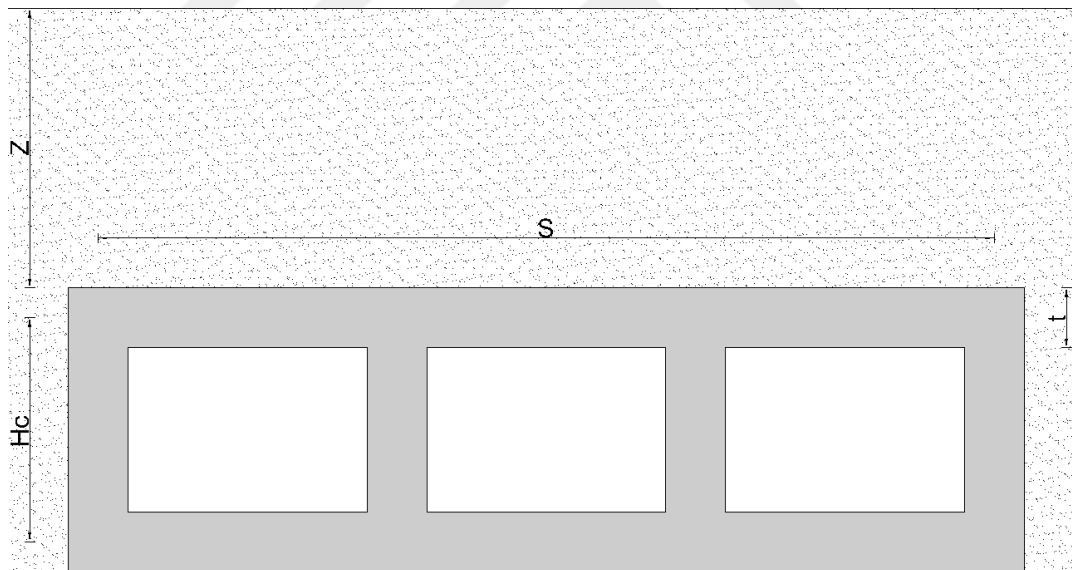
Typical reinforced concrete box culvert model and symbols.
